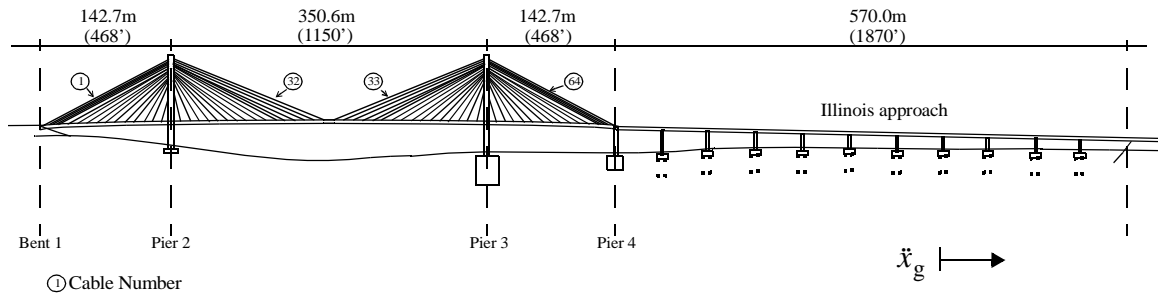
Drawing of the Cape Girardeau Bridge
